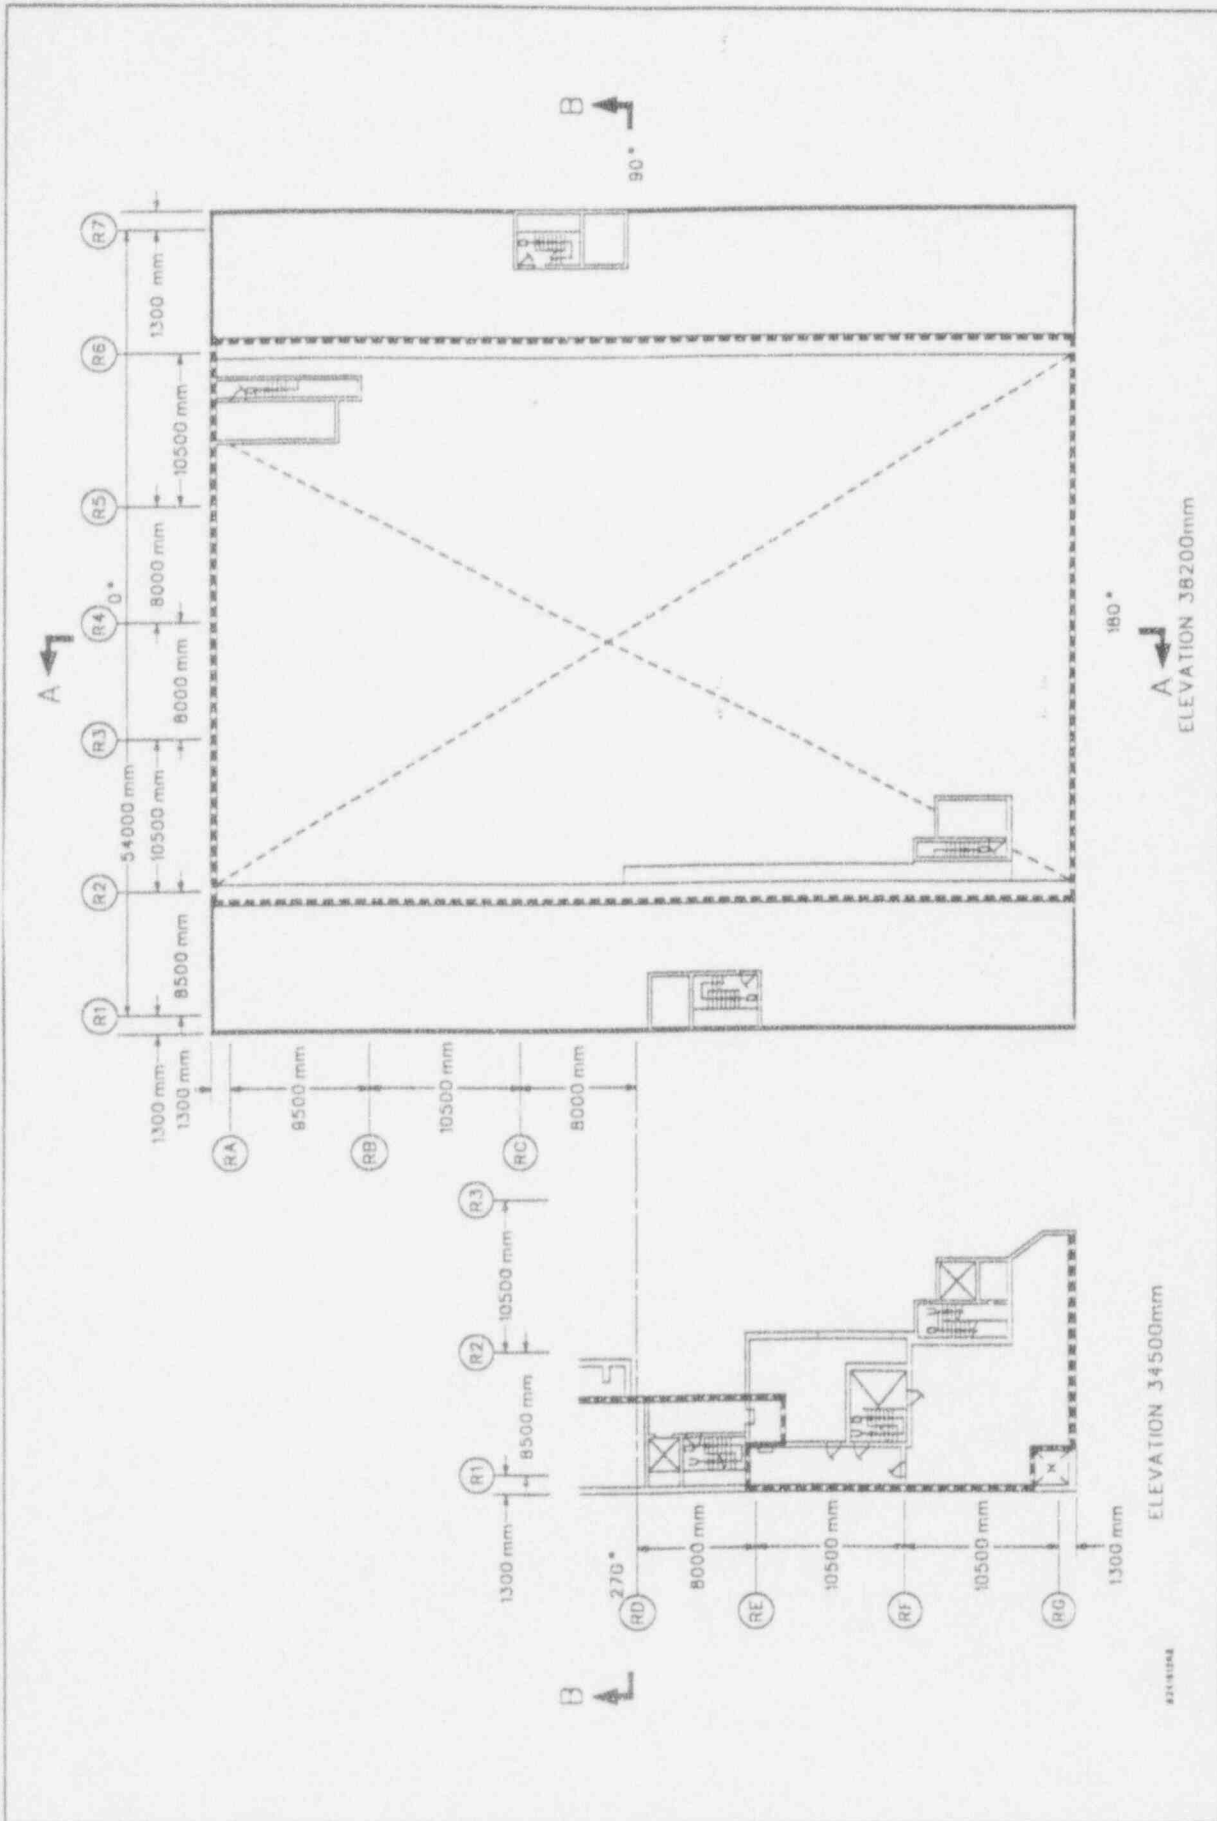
Reactor Building Arrangement—Elevations 34500 mm and 38200 mm
